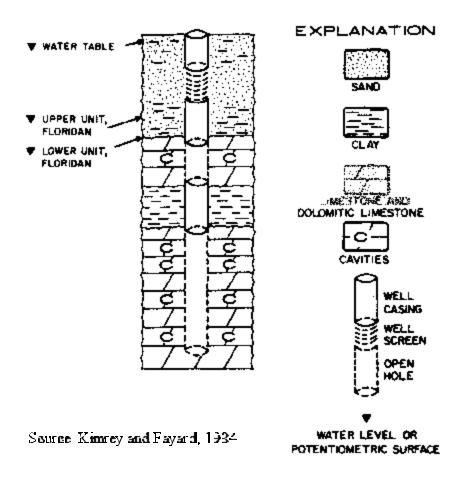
Typical Construction of a Swimming Pool Drainage Well in Florida
